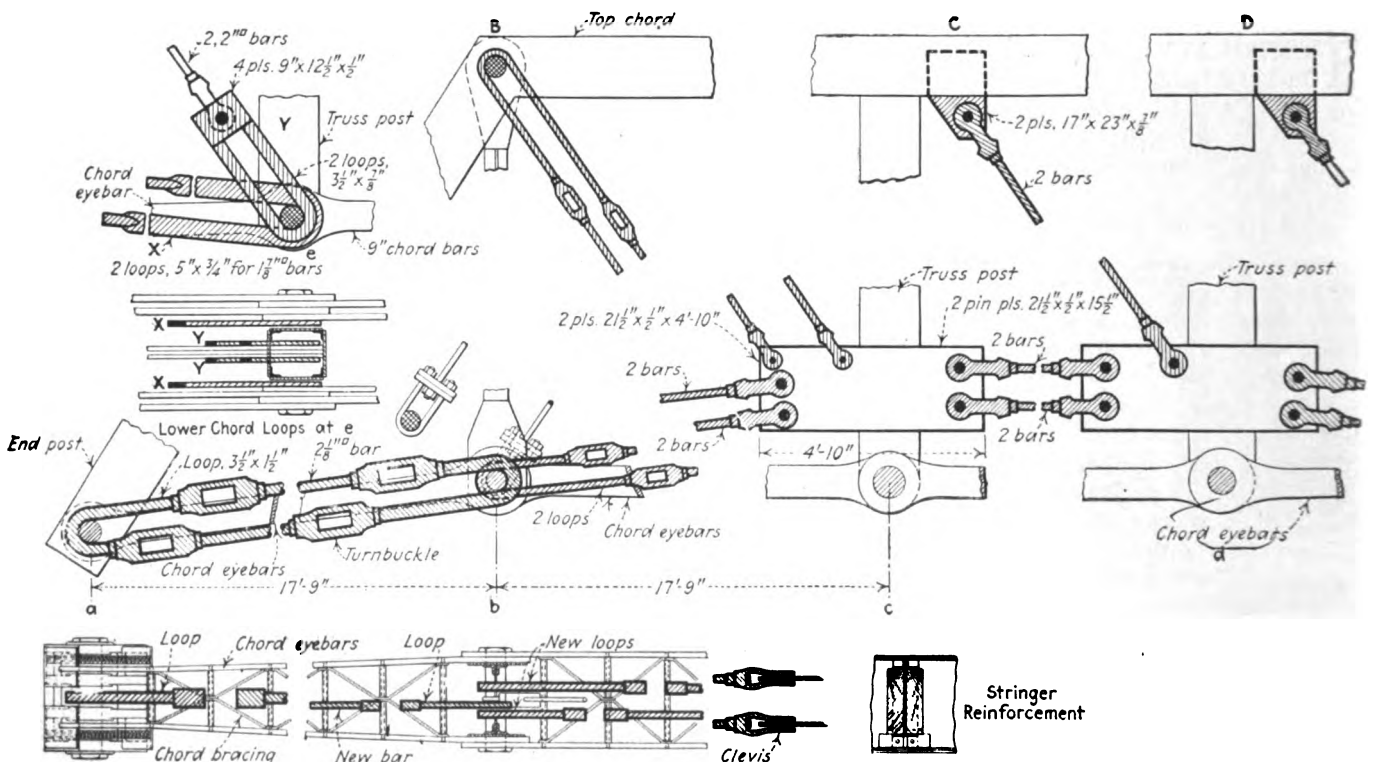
DETAILS OF REINFORCING MEMBERS OF BRIDGE TRUSS
